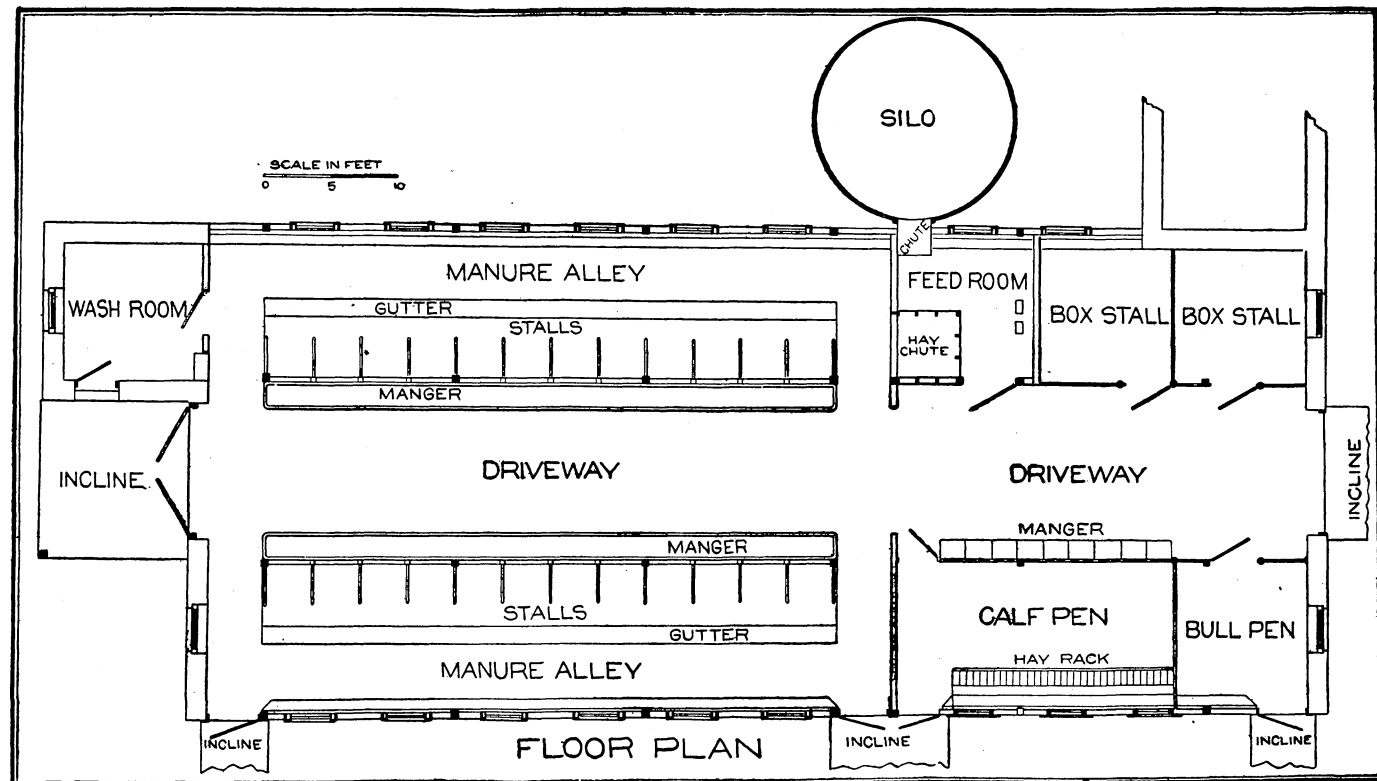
Floor plan of modern dairy barn for 24 cows.
